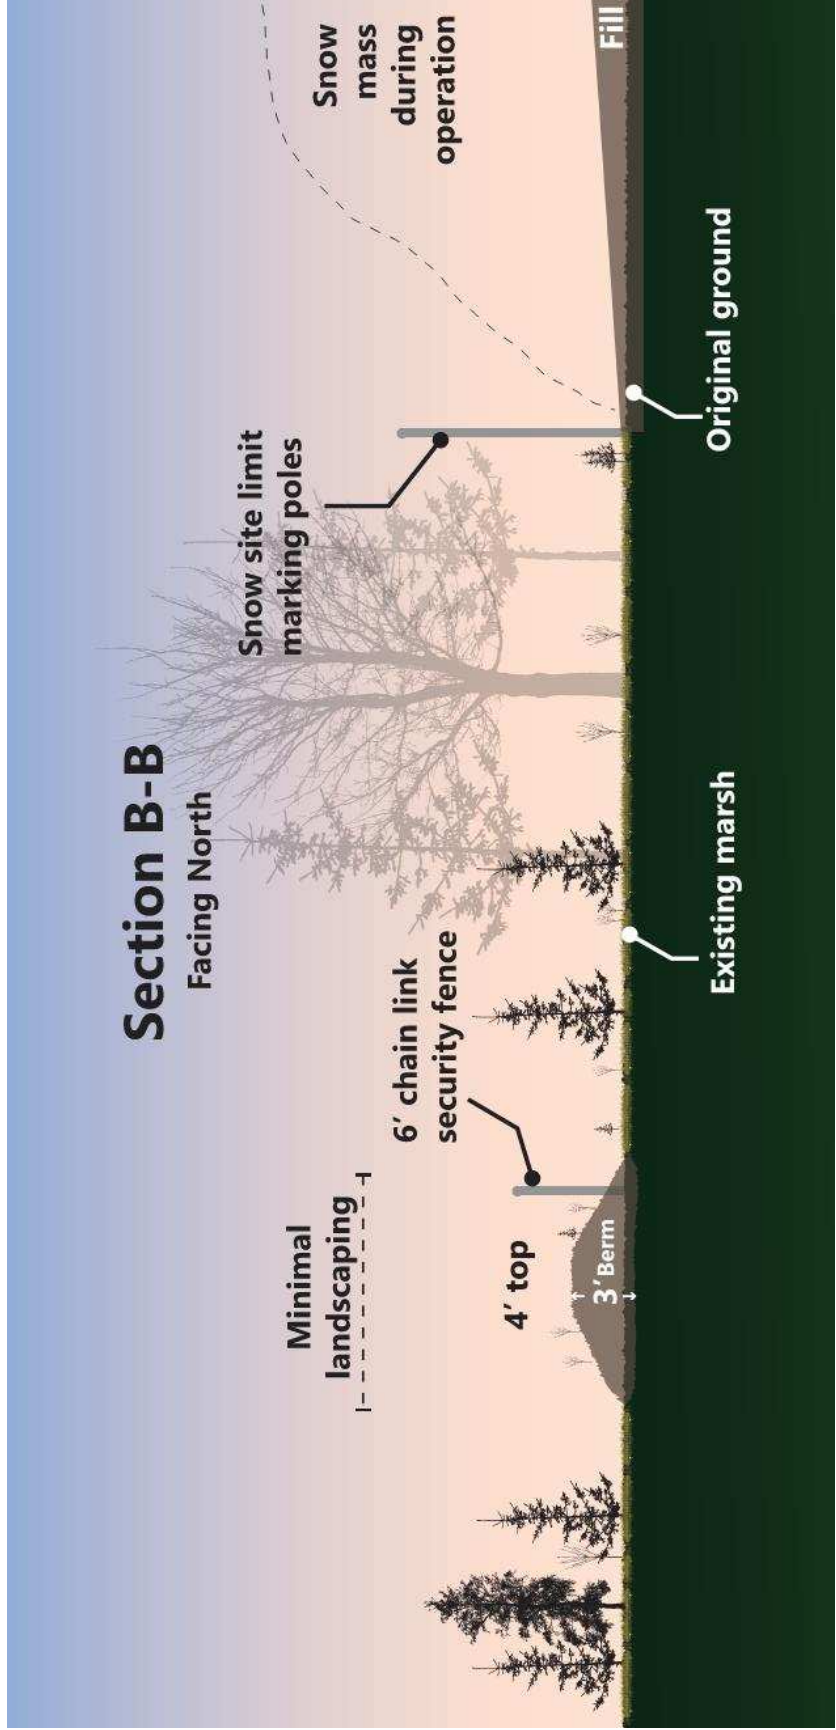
Snow Disposal Concept Design, Section B-B, 3 foot Berm
